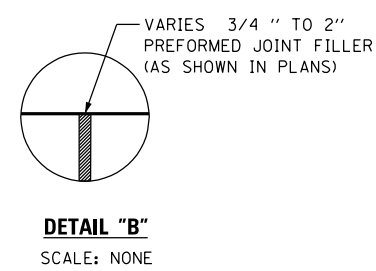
DETAILS OF CONCRETE BARRIER, VARIABLE CROSS SECTION,
